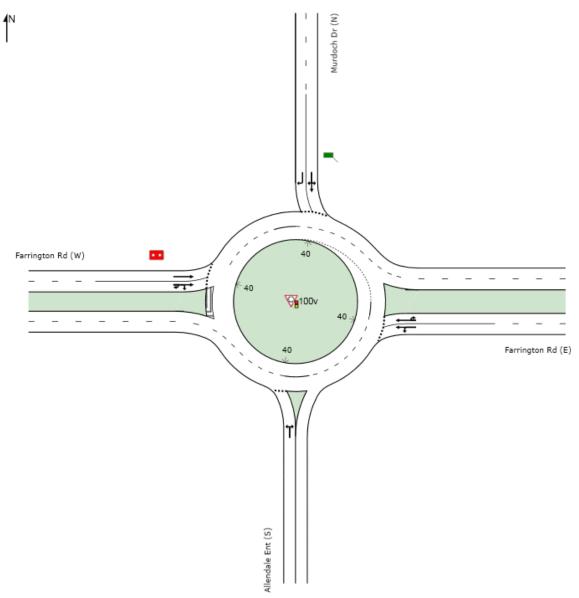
Murdoch Dr / Farrington Rd / Allendale Ent signalised roundabout layout modelled in SIDRA intersection analysis
